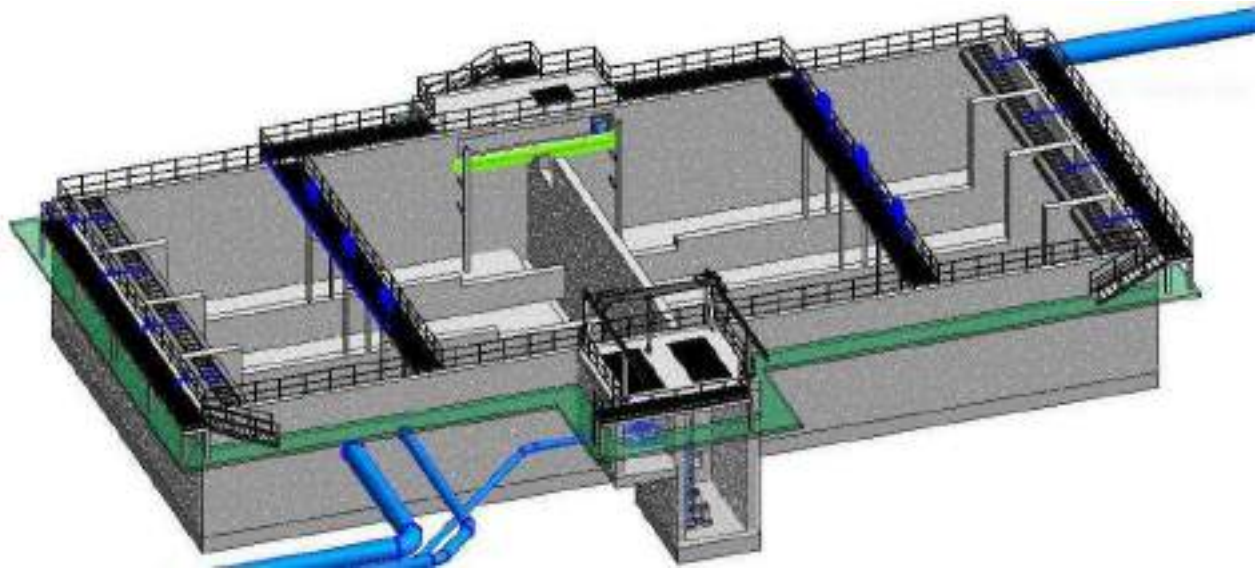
Revit Model of Proposed Storm Tank And Return Pumping Station
